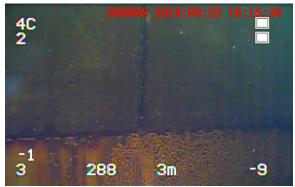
Joint filler missing from J2, photograph of contact with steel plate El 106.7 m.
